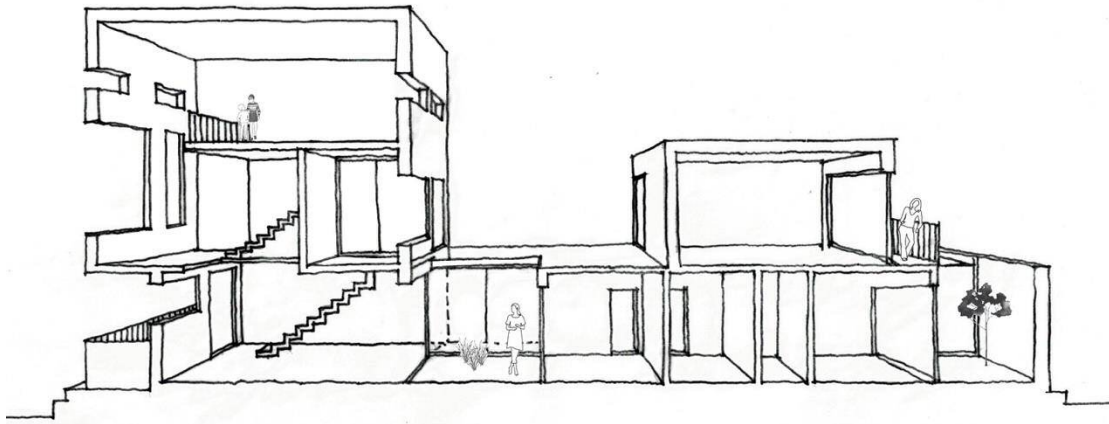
This drawing reveals the interior space of the proposed slim plan (type 2). Double storeys void spaces are used to reduce the sense of narrowness. The deep layout is break into two sections with an inner yard (terrace as in the first floor) in the middle.
